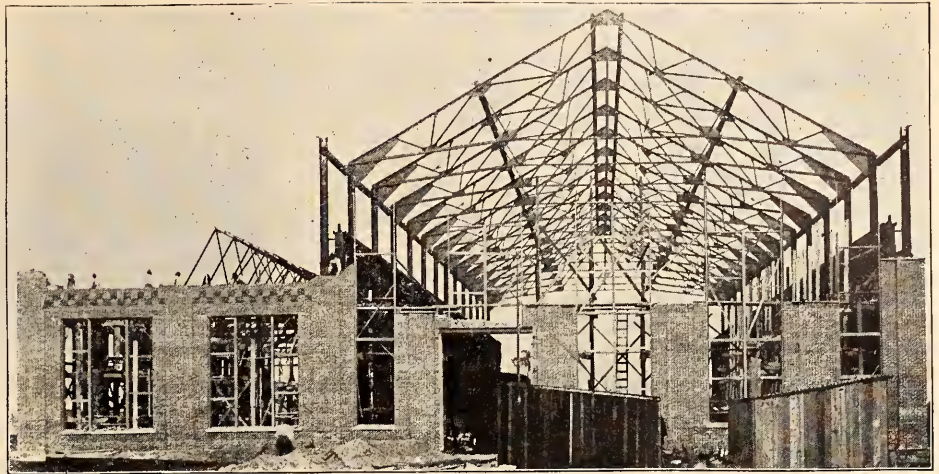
END VIEW, SHOWING STEEL CONSTRUCTION OF MACHINE SHOP—C. & E. I. R. R.
